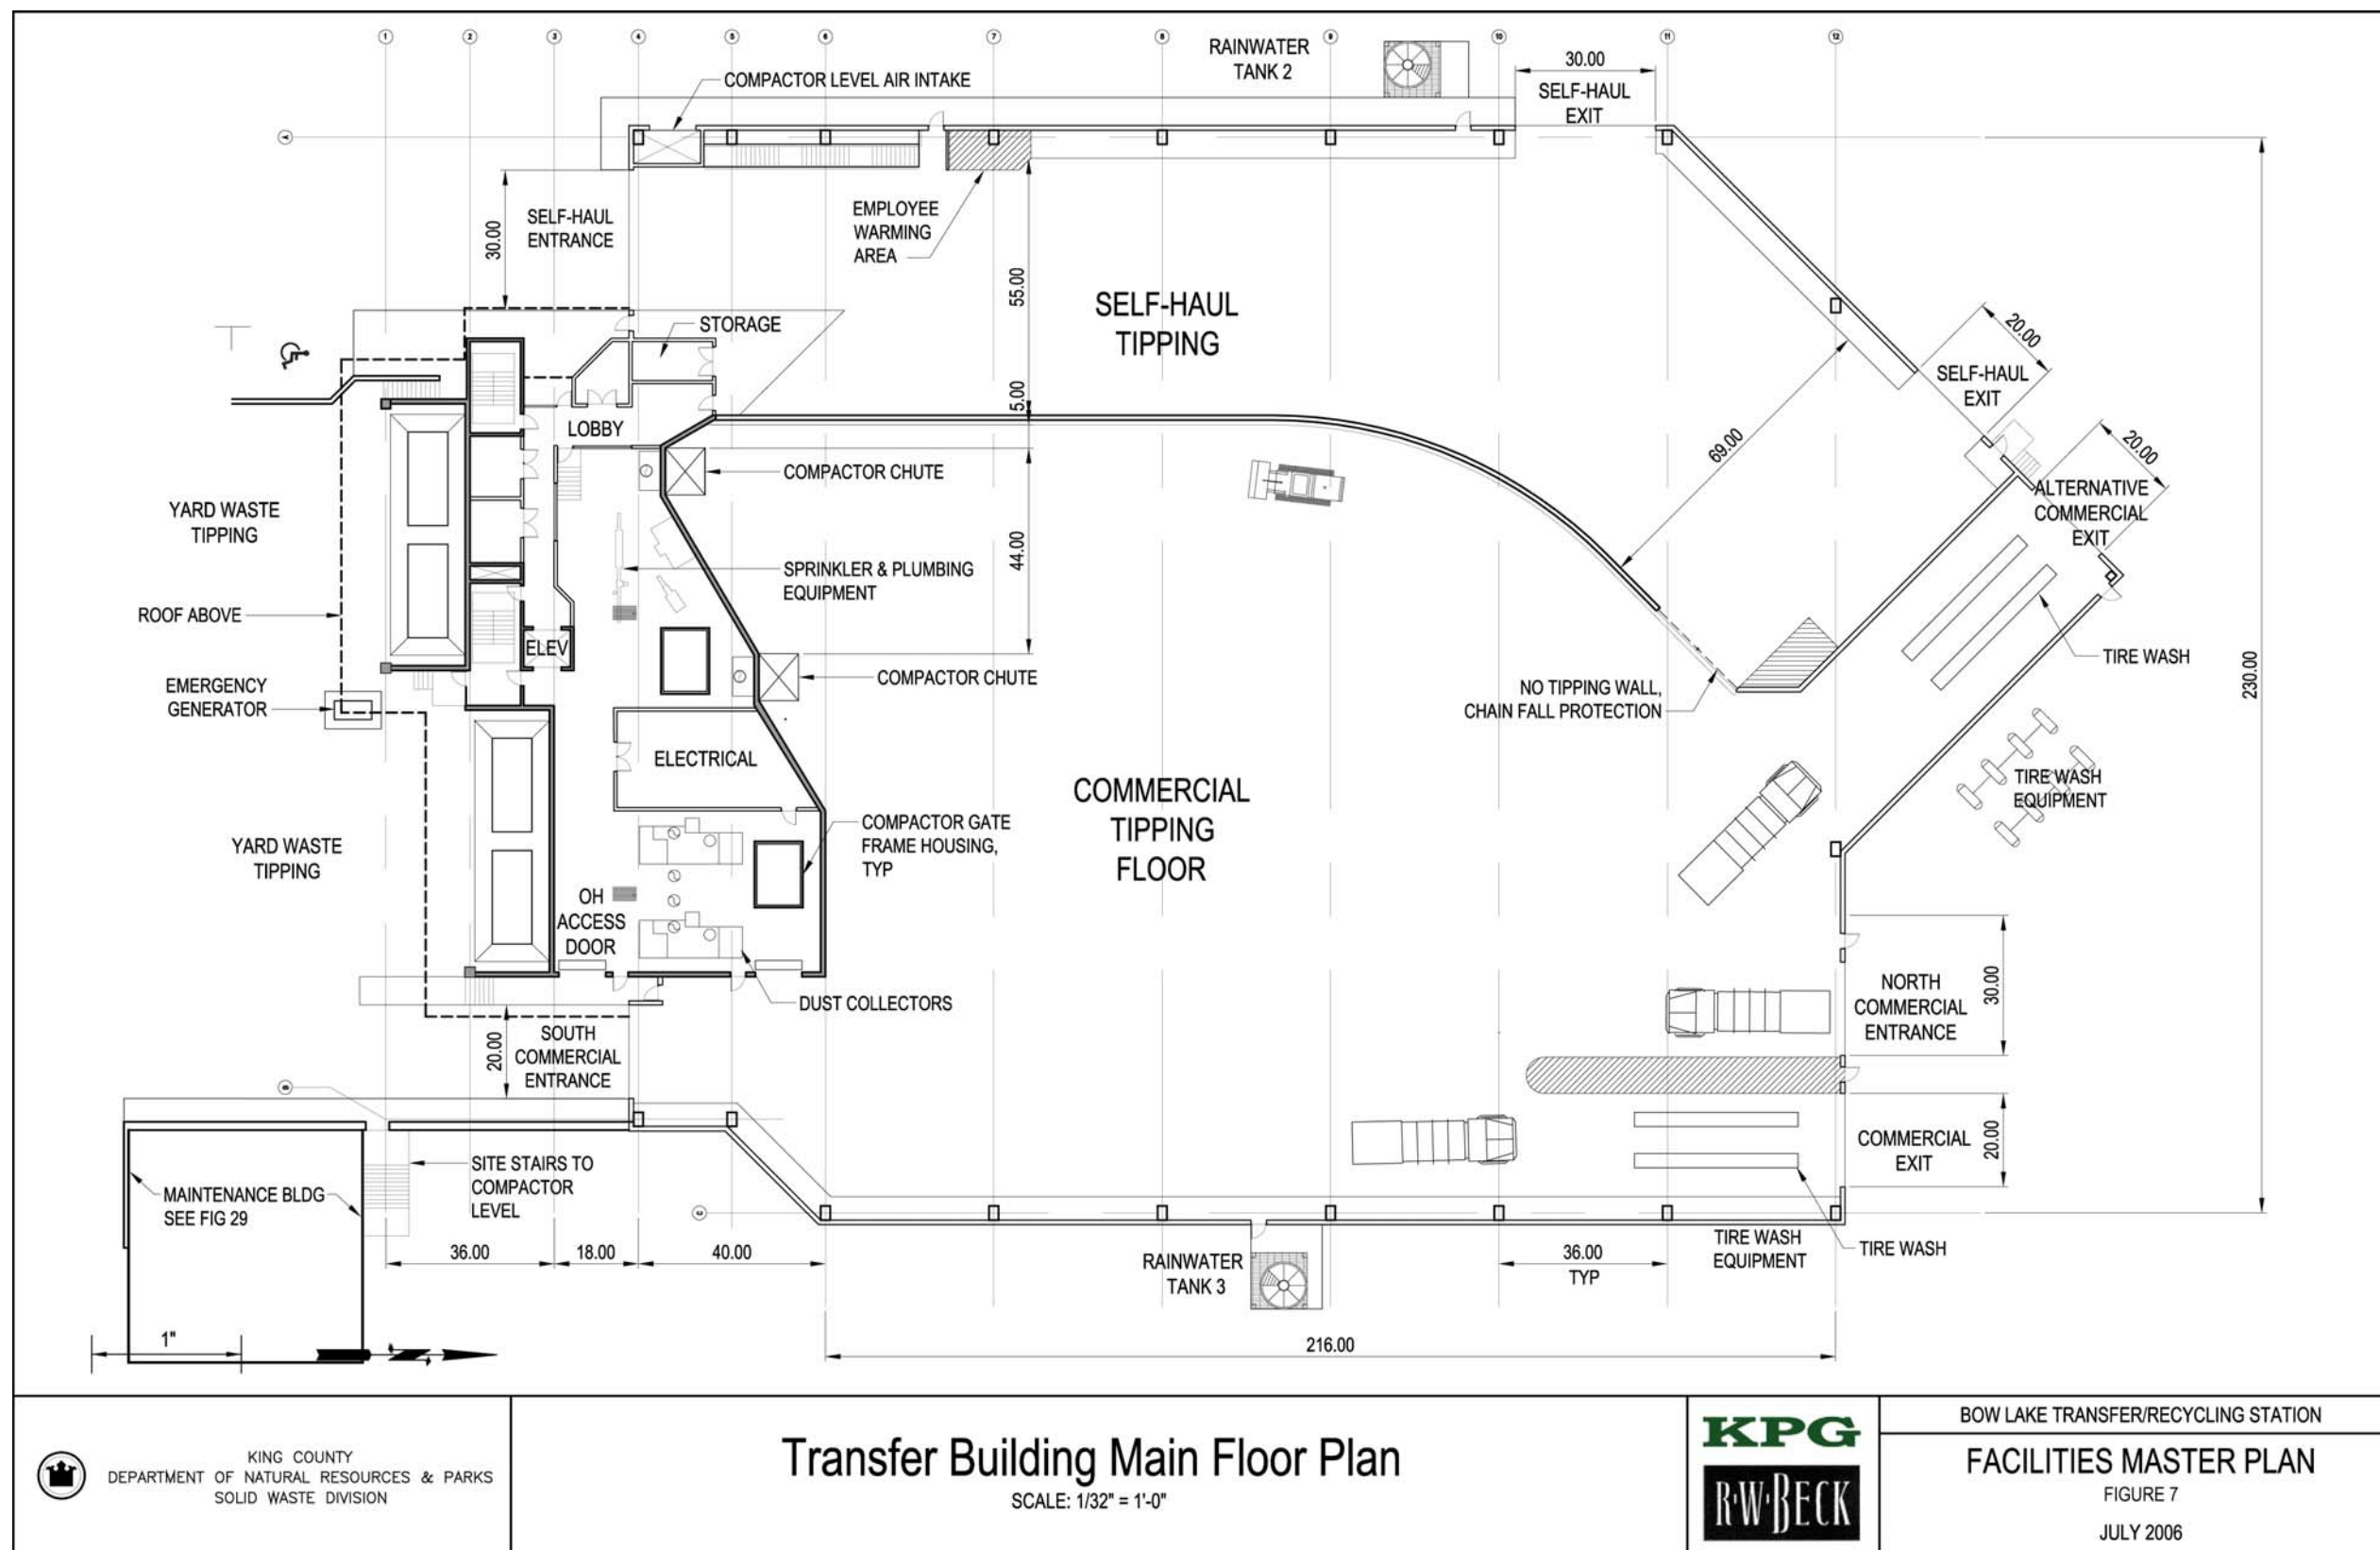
shows the detailed main floor plan. Building elevations are shown on Figures 8 and 9.
